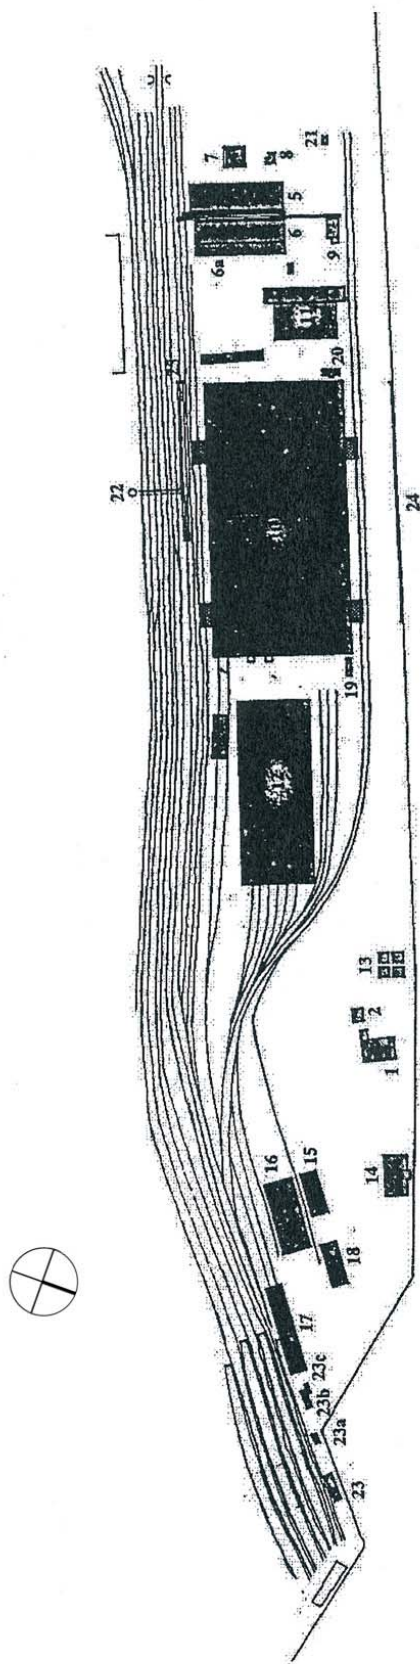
shows the layout of the site in 1895, at which time the first phase of development was complete and all the major buildings on the Carriage and Wagon Workshop side of the site were in place. The original layout of the site shown on this drawing included the following buildings, identified by their building numbers as per the DCMP and Figure 10:
